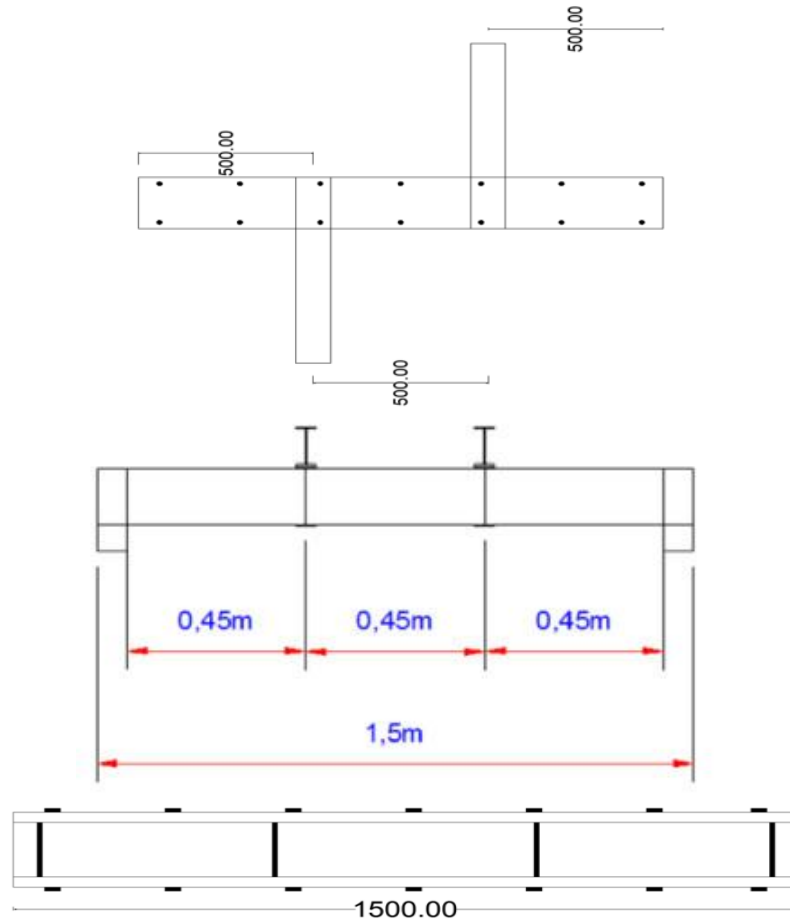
Details of box web cold-formed steel beams and Number of stiffeners and the distances between them
